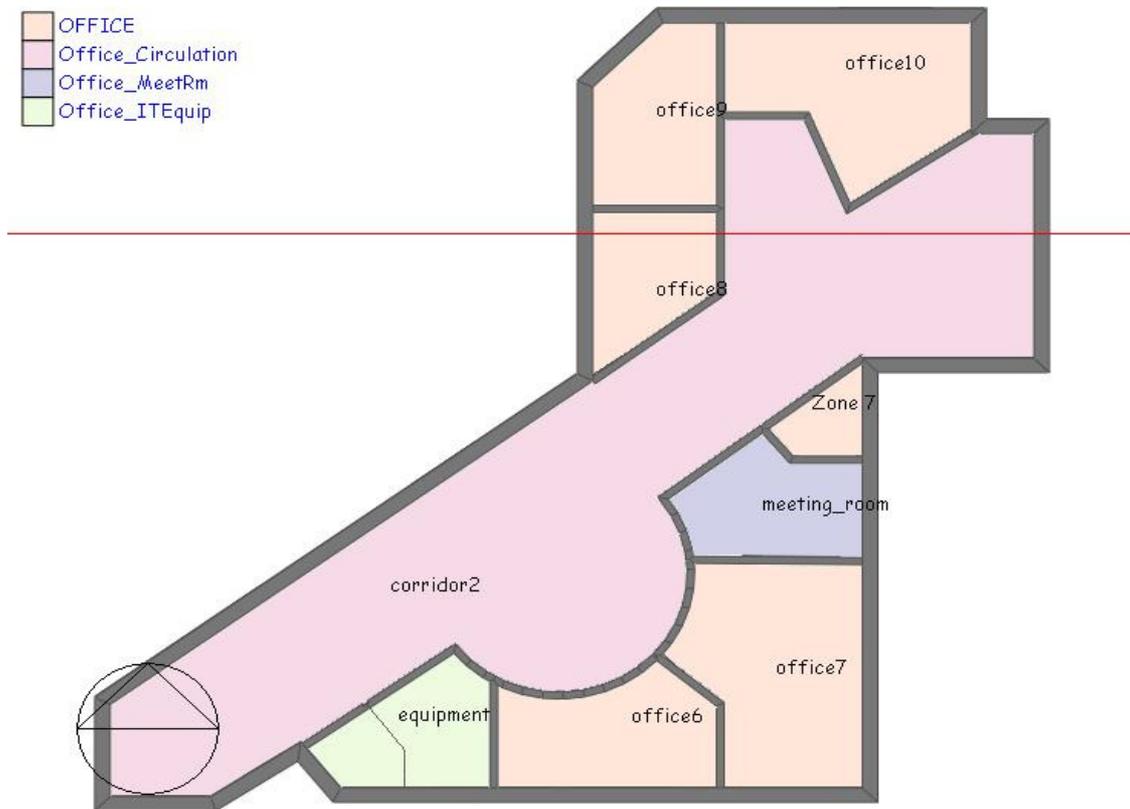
Plan of the second floor as designed in DesignBuilder.
